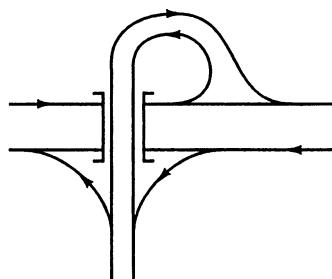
A form of trumpet intersection to avoid existing development
